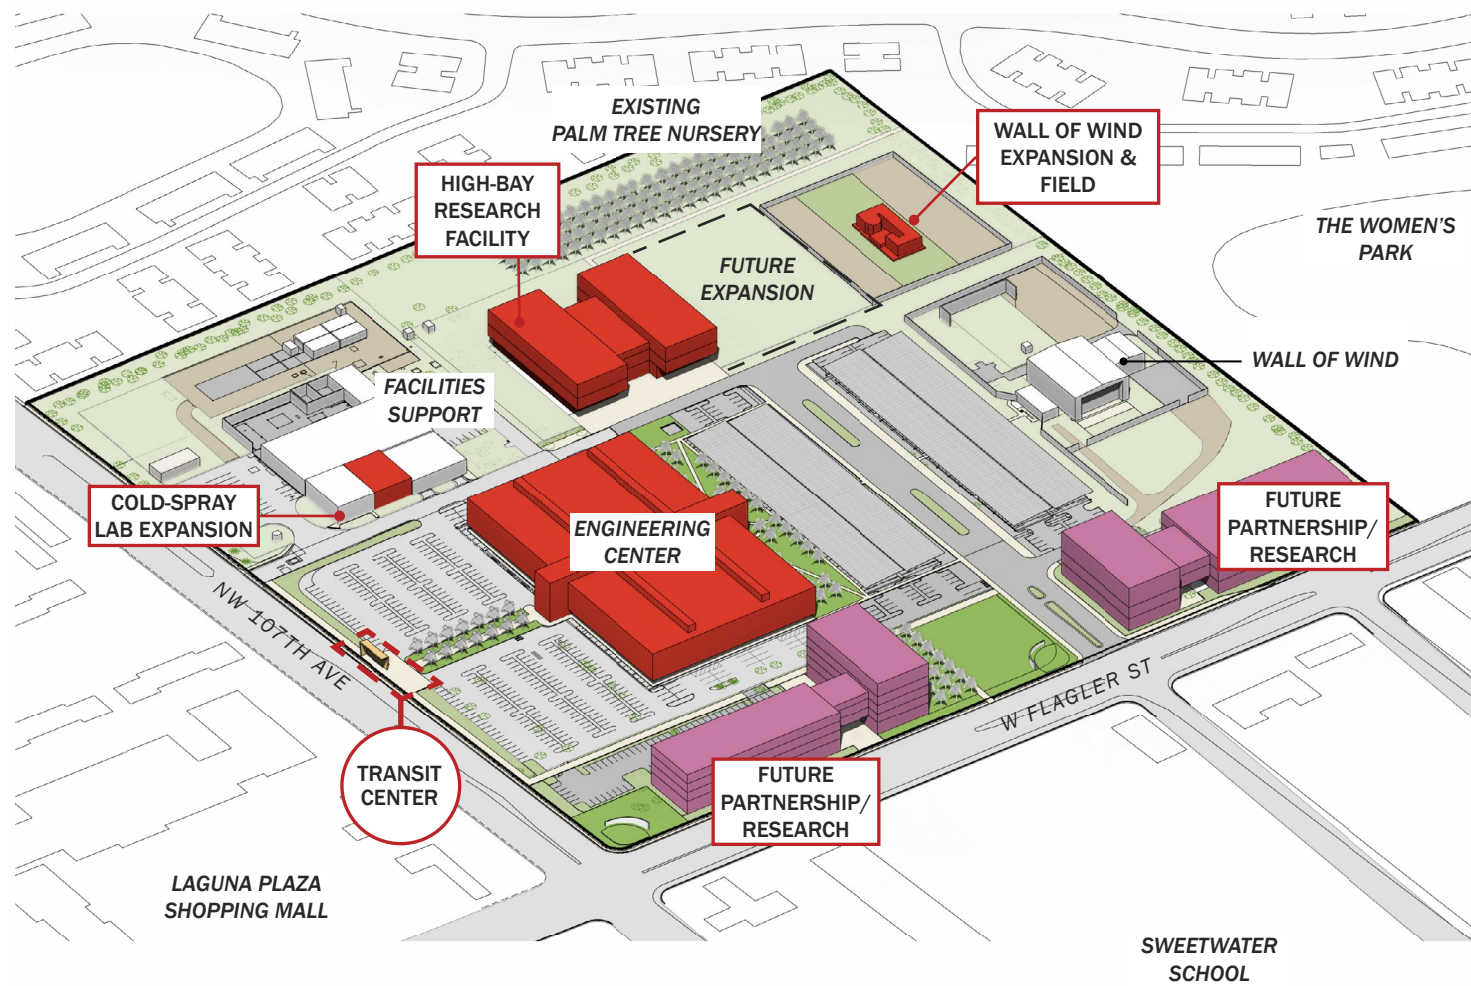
EC 3D DIAGRAM - 2035 FACILITY PLAN
